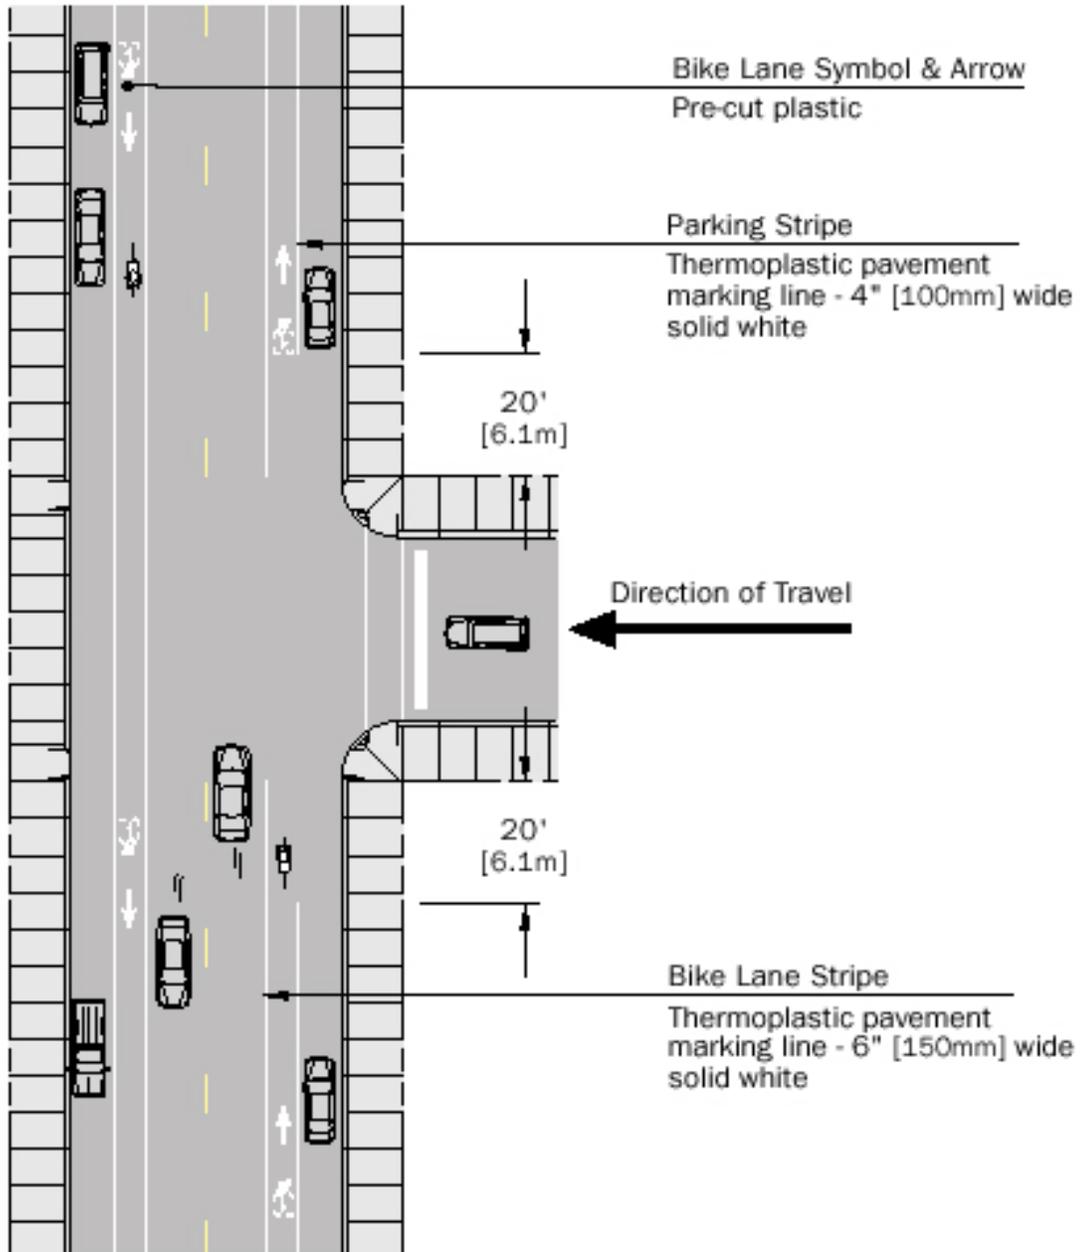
Striping for bike lane with parking at T-intersection with one-way local street
